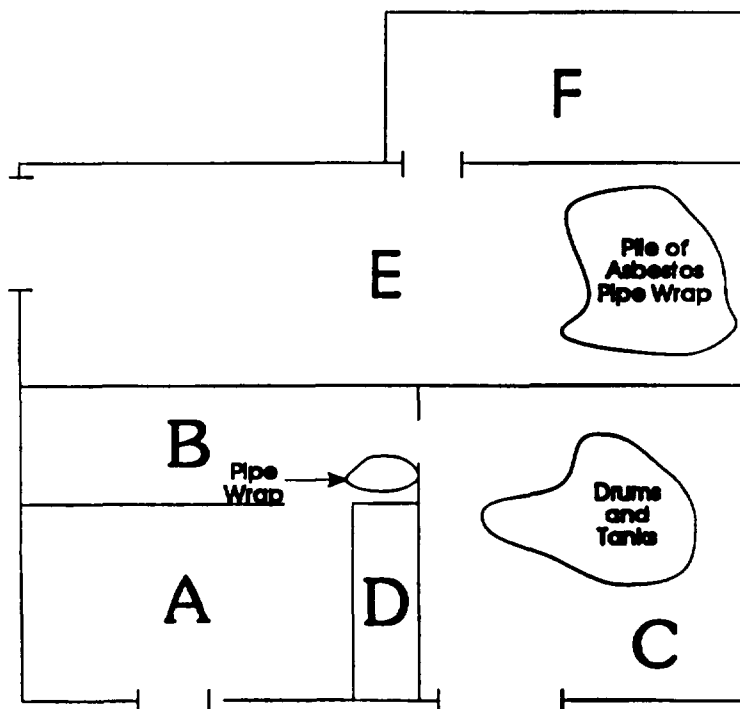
SKETCHES OF BUILDINGS #3 & #7
